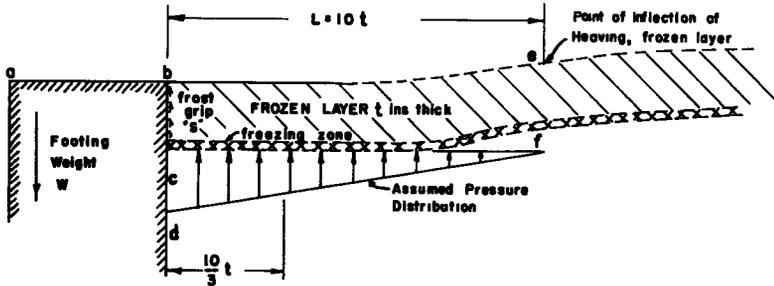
Sketch showing mechanics of heave of a continuous footing.
